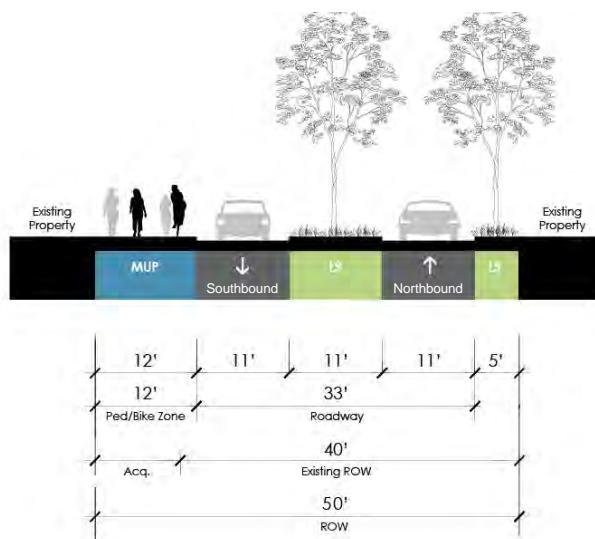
Typical Section Segment 2 (20th St NE to 22nd St. NE)
